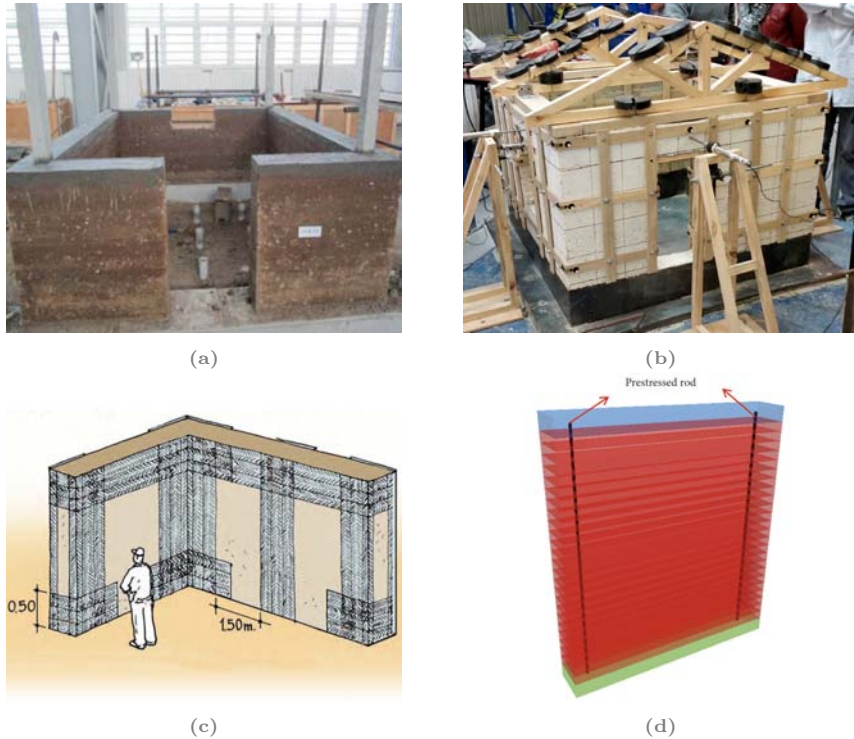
Seismic reinforcement solutions for RE buildings: (a) concrete columns and bond beam (scale model under construction) [245], (b) confining wooden elements (scale model) [138], (c) wire mesh (recommended layout scheme) [239], (d) vertical prestressed steel rods (DEM model) [81].
